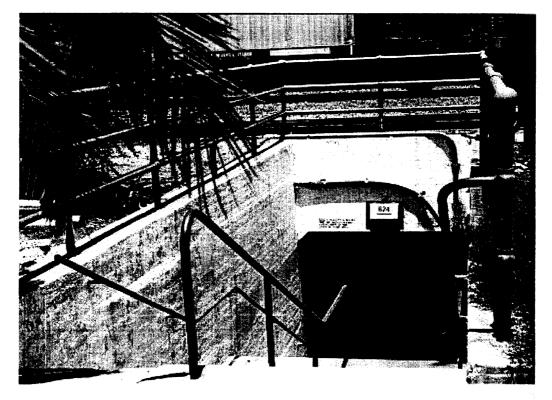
Extant underground tunnel entry leading under the train tracks, circa 1918, facing north.
